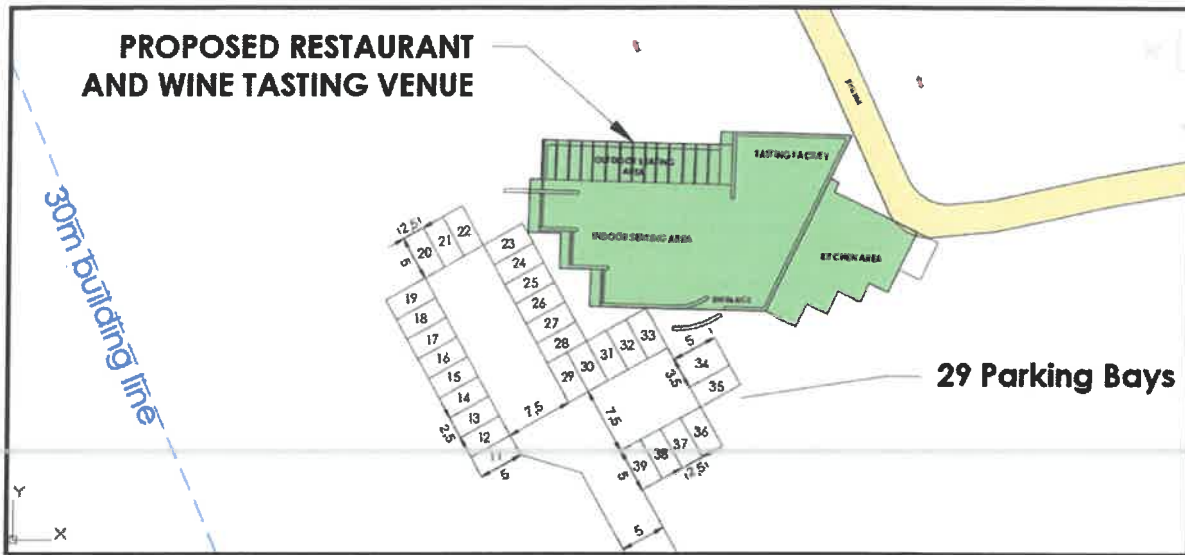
Proposed tourist facility (Tasting facility and Restaurant).
